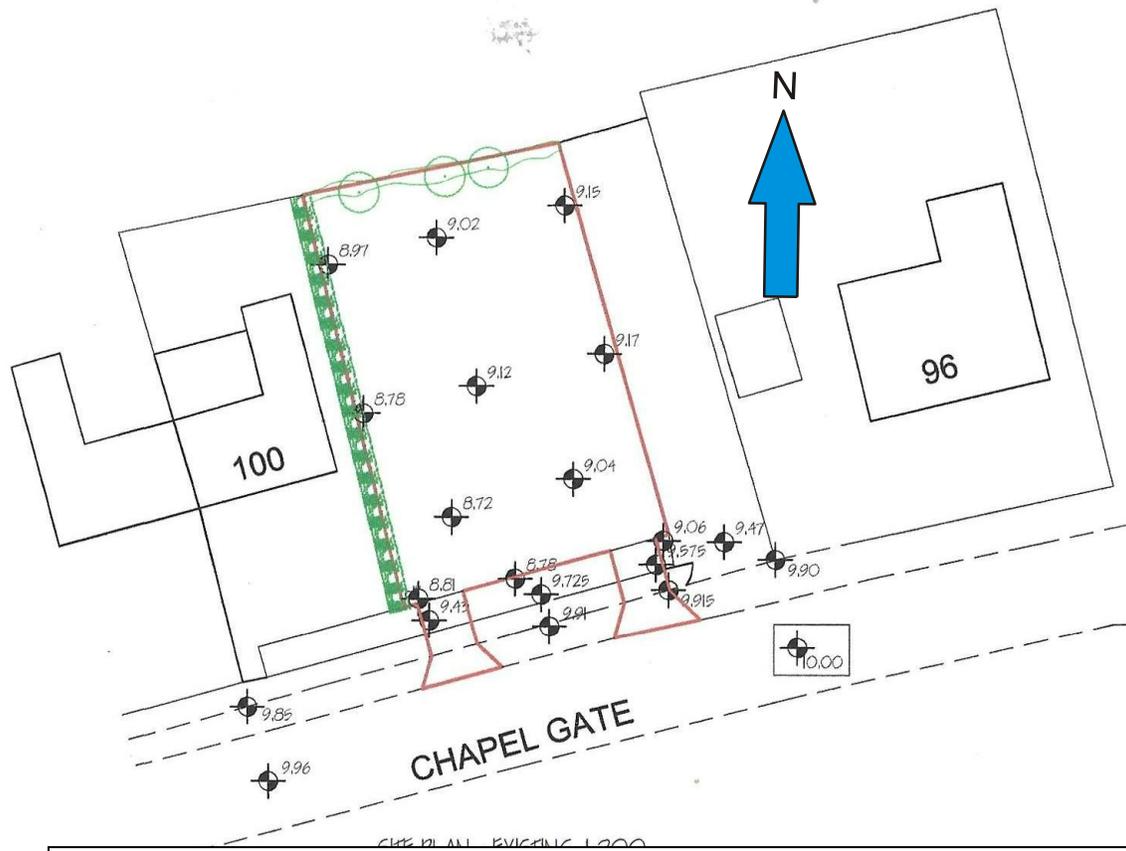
Block plan showing the existing layout of the development site at an original scale of 1:200, (extract from Architects plan)
